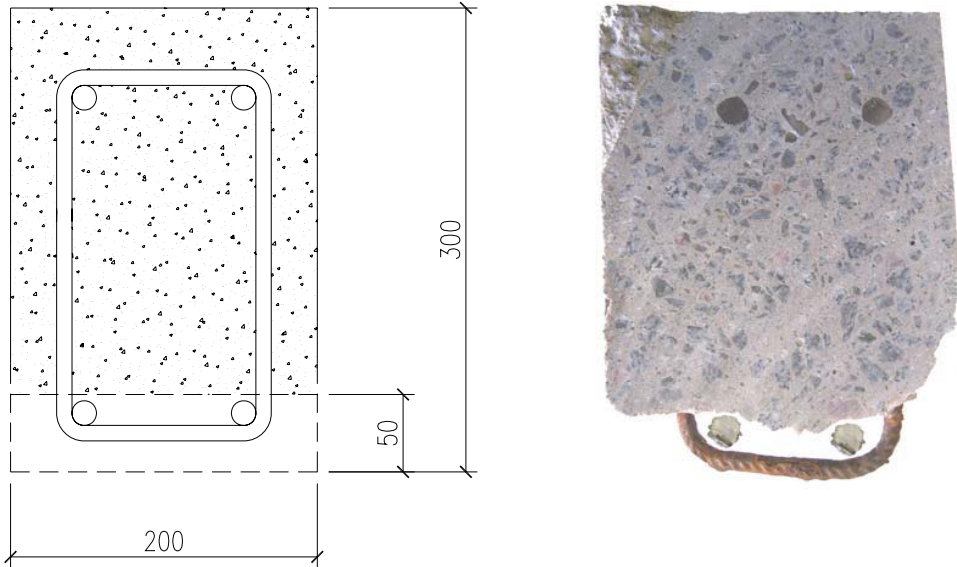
Left: A sketch of the cross section of the beam where concrete to a depth of 70 mm was removed. Right: Cross section of real beam where concrete was removed.
